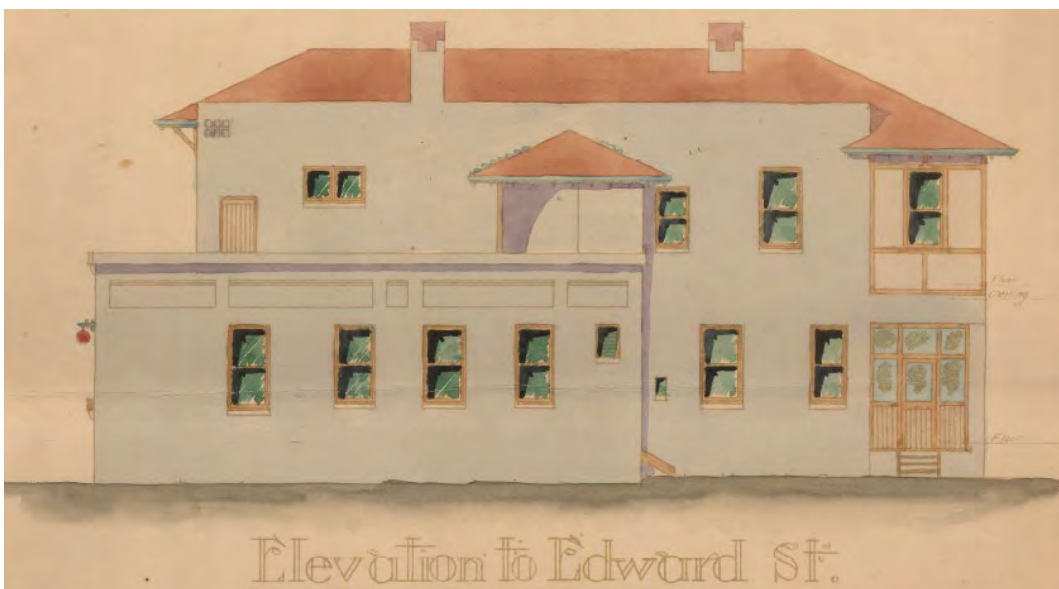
From the original drawings by Reginald V Courtney, side/south elevation (Source: Council Building File)
